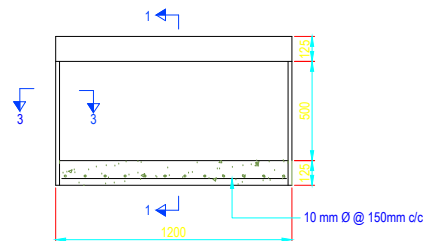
DETAILS SECTION OF STONE MASONRY SIDE DRAIN
